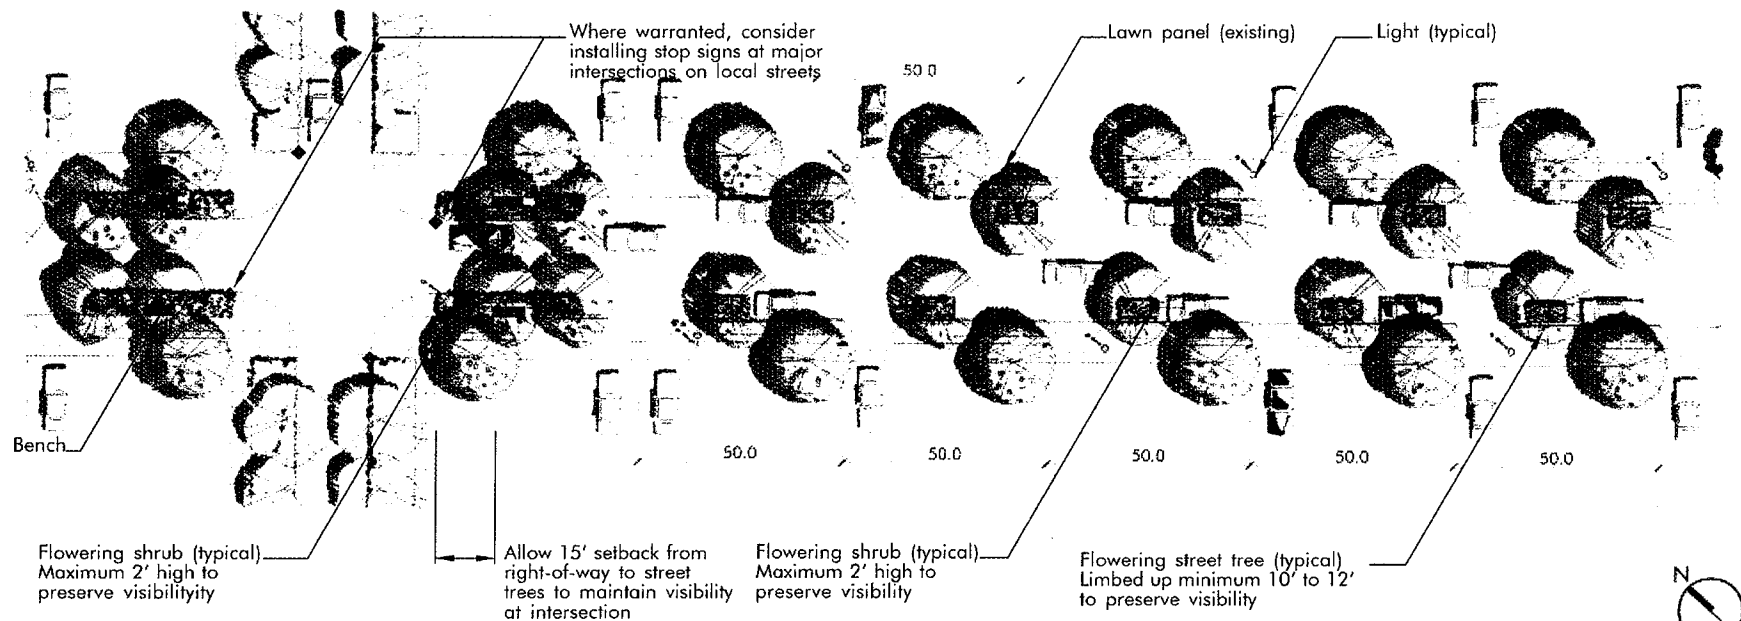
Recommended Concept for Local Street with Existing Monolithic Curb
